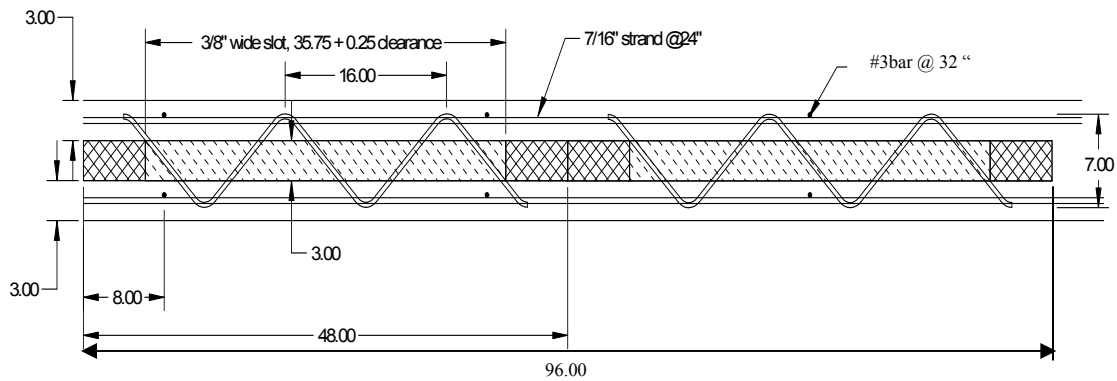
Details of full-scale specimen (using NU-Tie-V4 connector), with #3 bar @ 32 in. as transversal reinforcement
